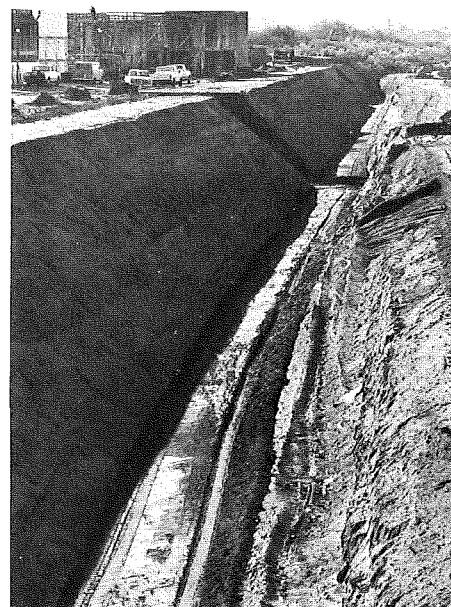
Pantano Wash bank undergoing soil-cement process. Photo by Ken Matesich.
